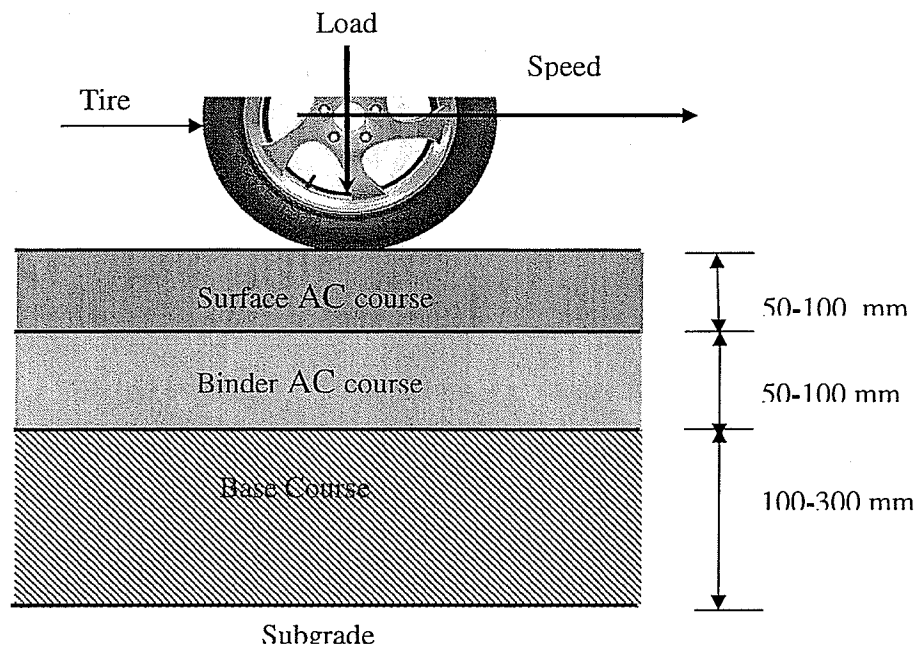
Typical cross section of asphalt pavement (not to scale).
